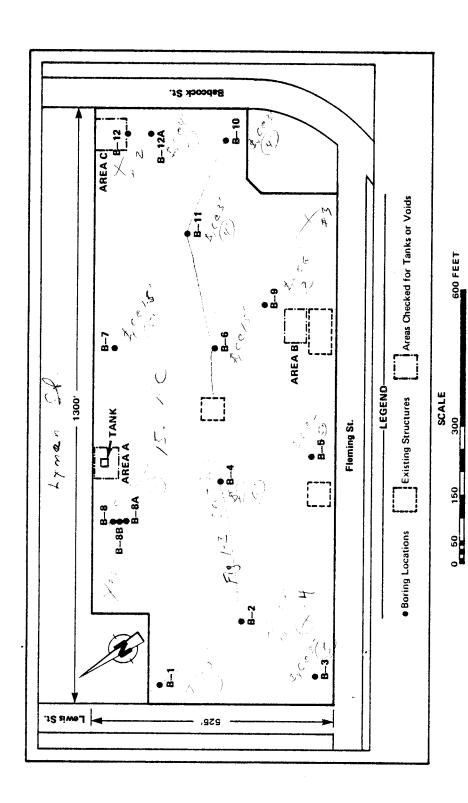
LOCATION OF BOREHOLES ON BABCOCK STREET SITE
